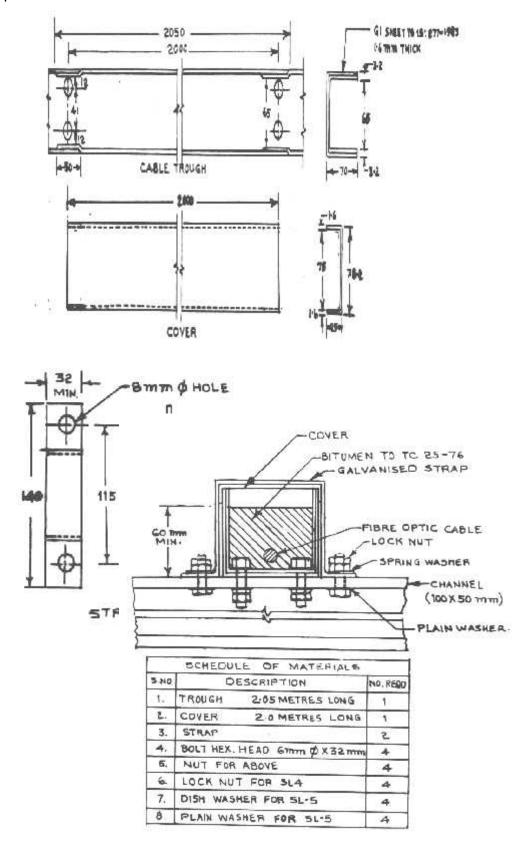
Drawing of arrangement of cable troughs and channel for girder bridges and major culverts as per RDSO/TCDO/COP-12
